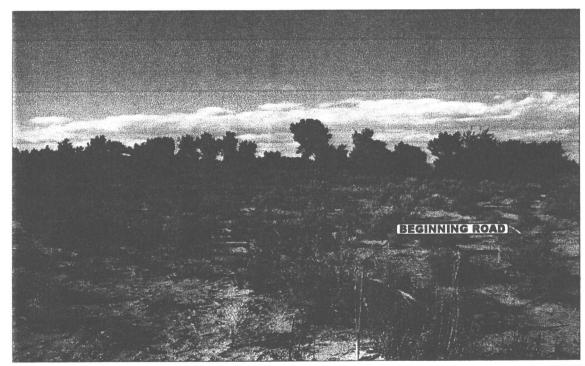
PHOTO: VIEW FROM BEGINNING OF PROPOSED ROAD
